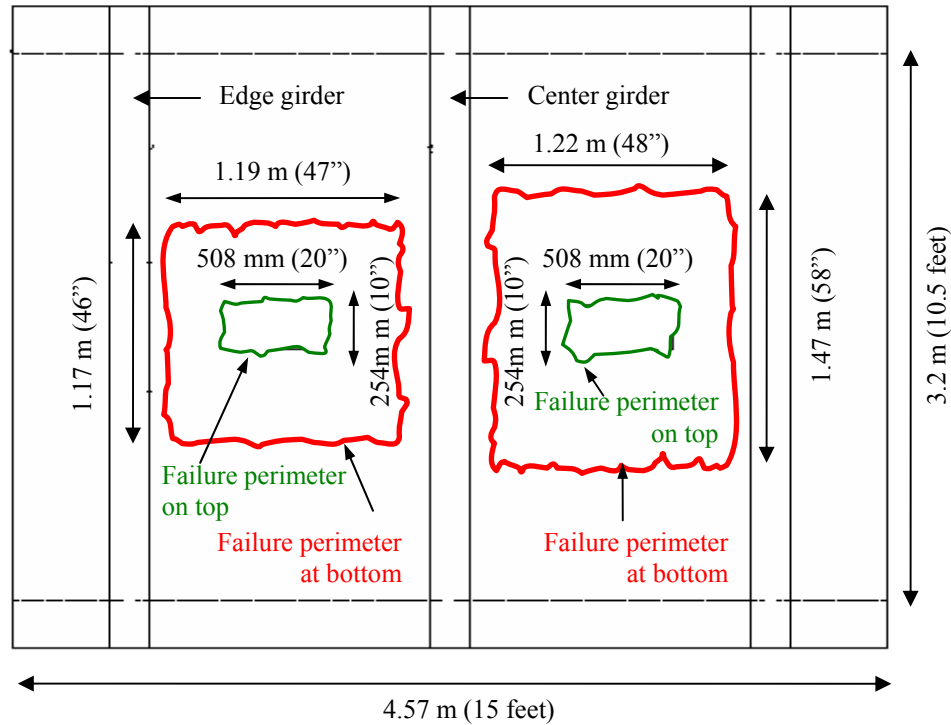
Schematic of punching shear failure perimeters in slabs
